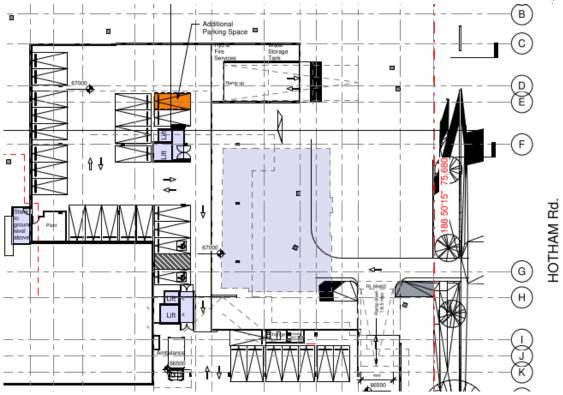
Basement parking level within restricted one-way access from the north car park to south
